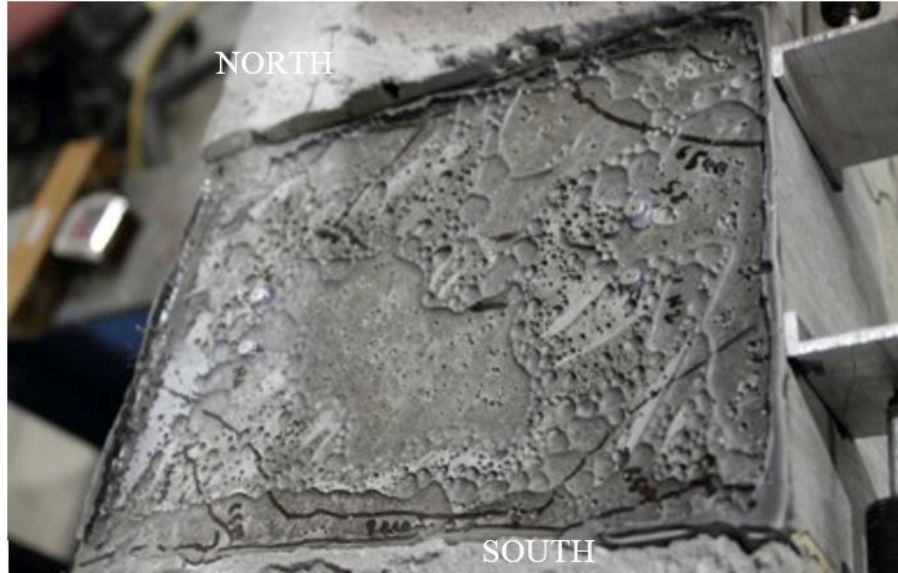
UHPC pocket in specimen U-4-5-I-E showing interface separation and flexural cracks.
